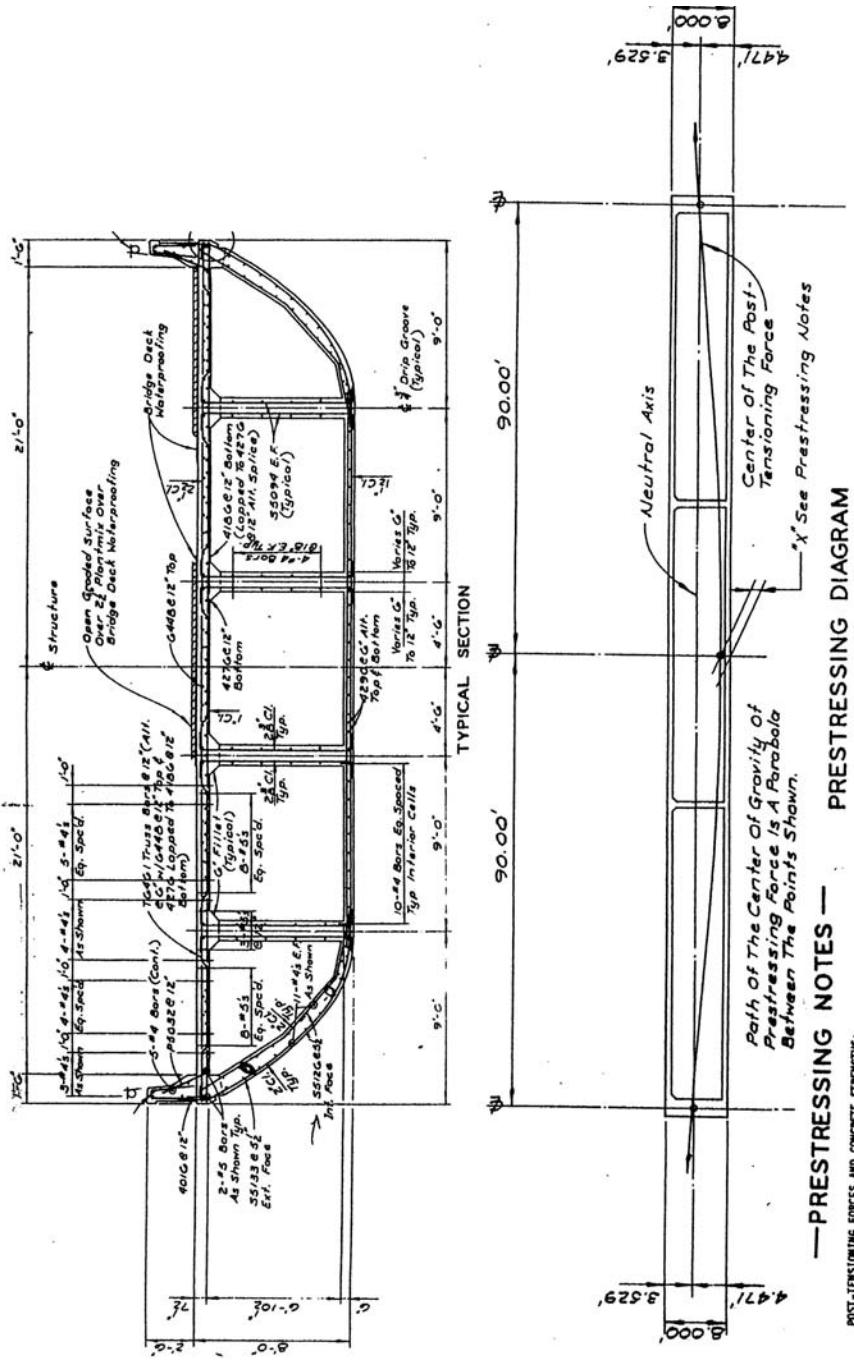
Bridge I1301E Typical Section and Prestressing Diagram
